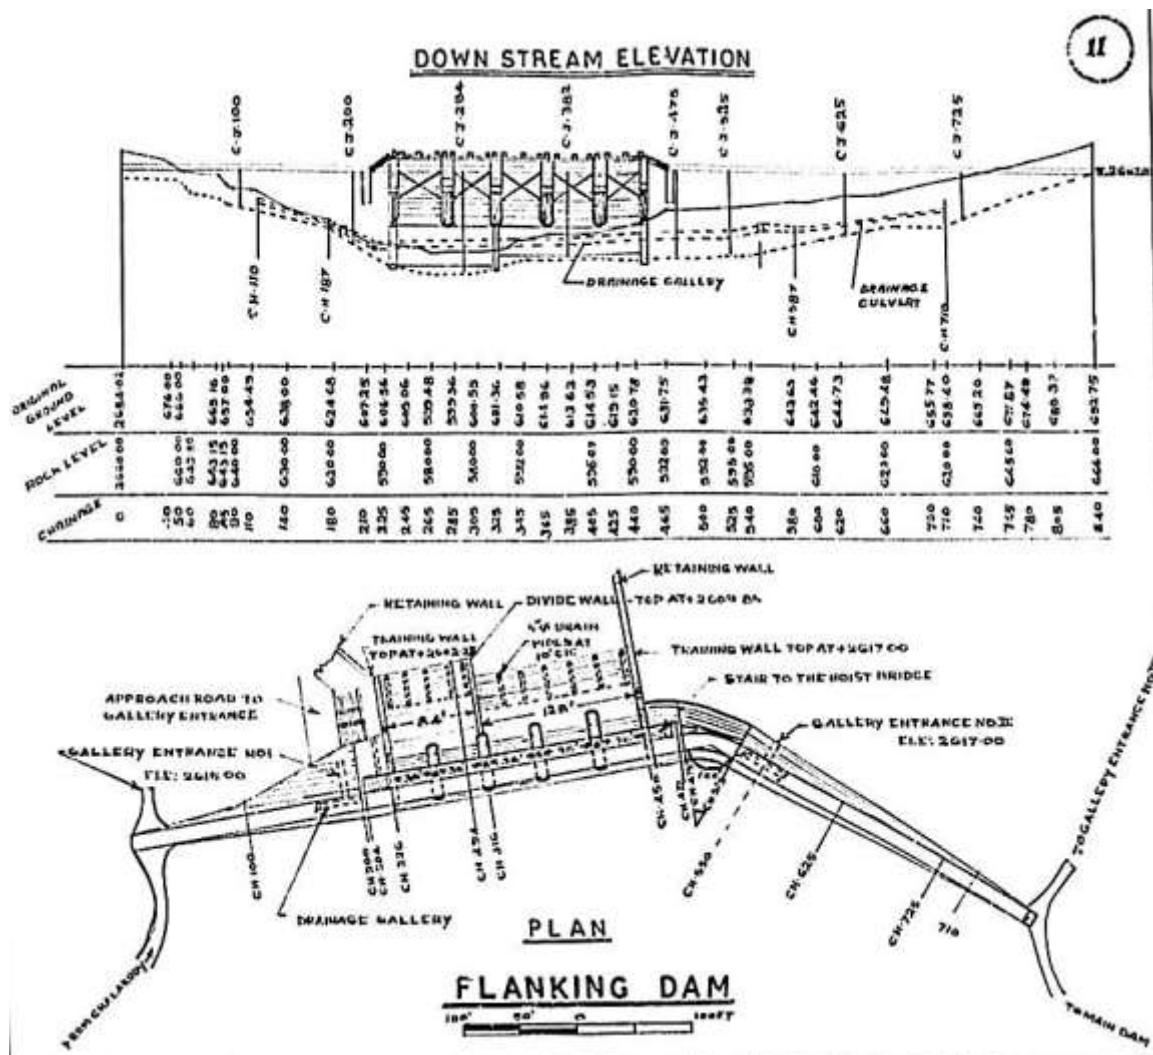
Plan and Down Stream Elevation of Flanking Dam
